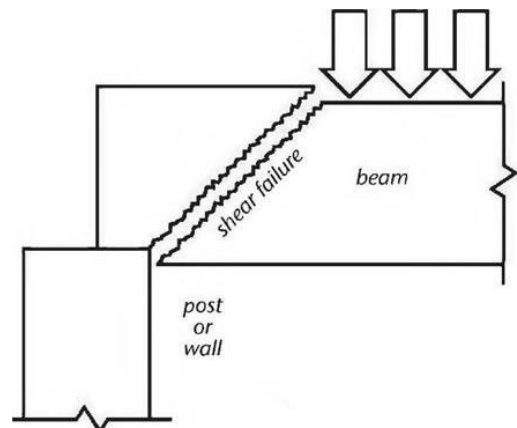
shear failure of a concrete beam or wall near a support
